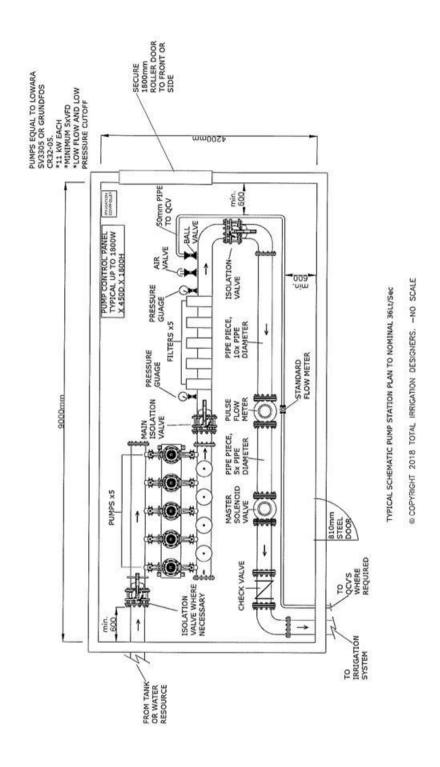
Pump Station Schematic Layout – Flows between 27 to 36 Lt/sec
